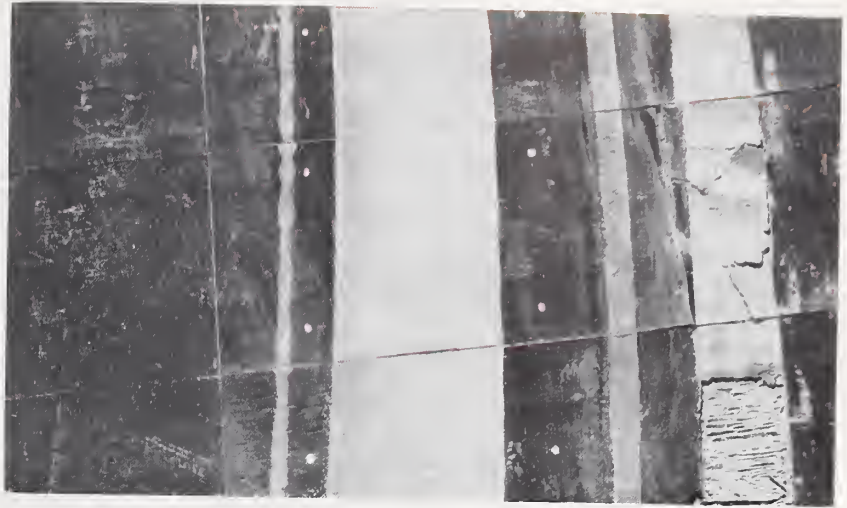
Asphalt and pitch mastic felt-base tile on wood subfloor (test panel 10R).
